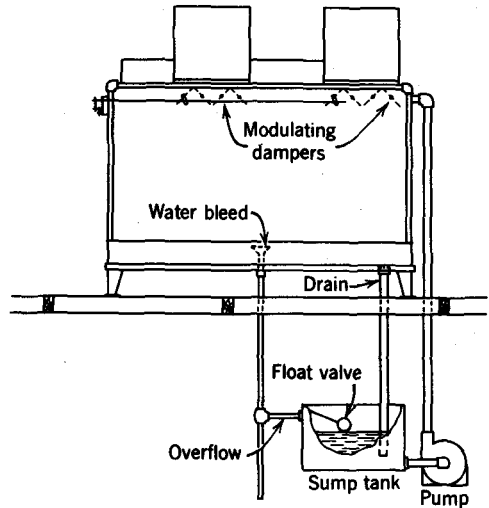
Evaporative condenser equipped with modulating dampers for capacity control. Protected auxiliary pump is designed to prevent freezing during winter operation. (Courtesy Refrigeration Engineering Inc.)
